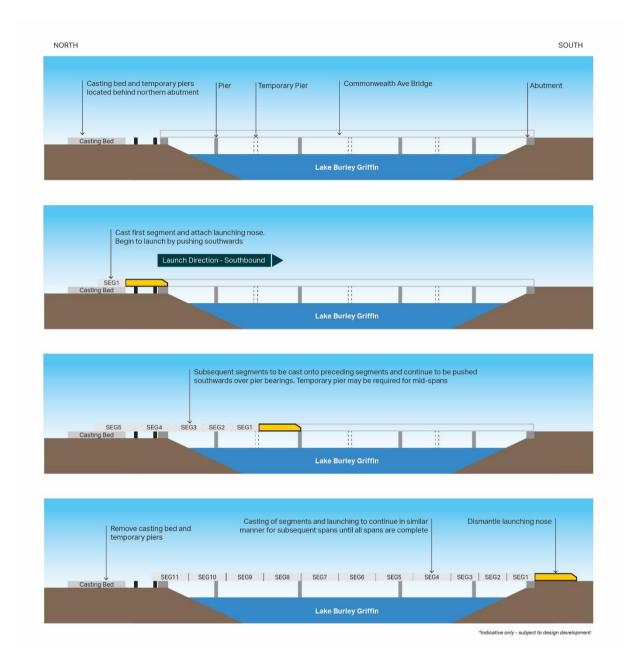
Commonwealth Avenue light rail bridge - incremental launch method
